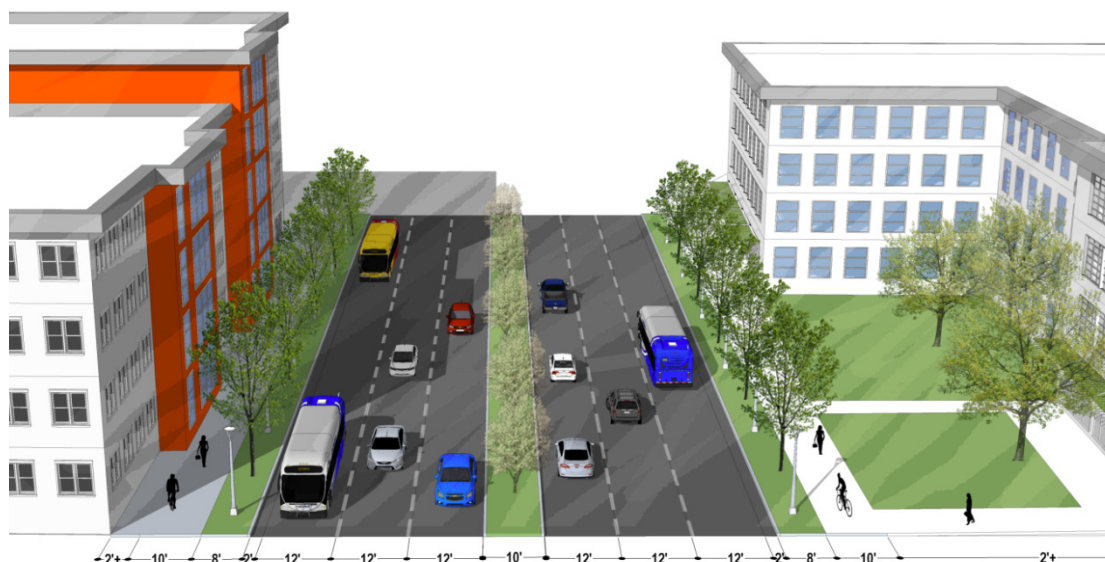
Alternative 2: BRT – Curb, Typical Section (Pohick Road to Woodbridge VRE)
